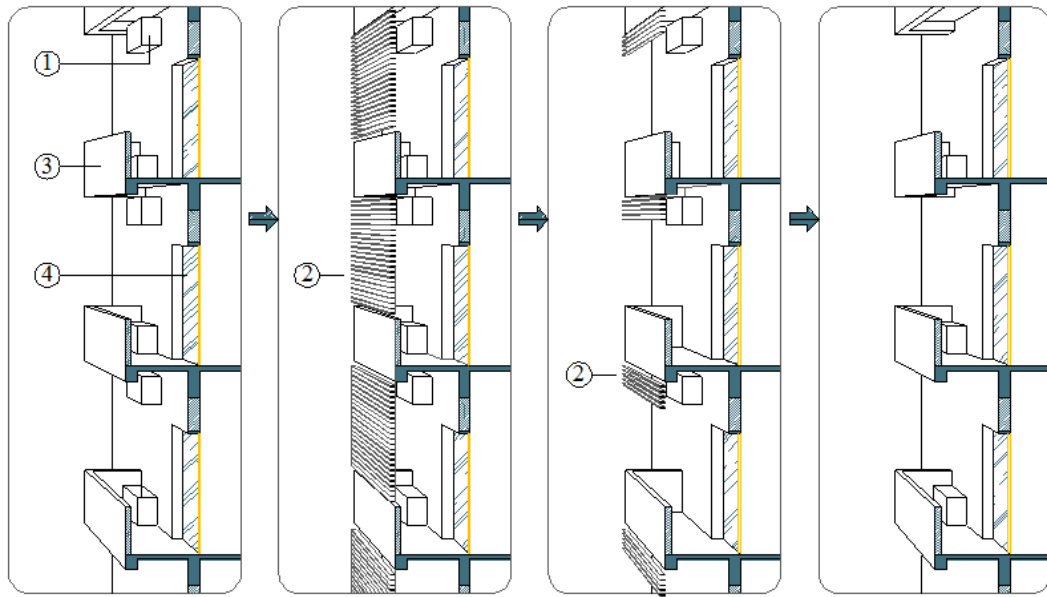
Corner plan to elevation layout of the PB with balconies, loggia.
